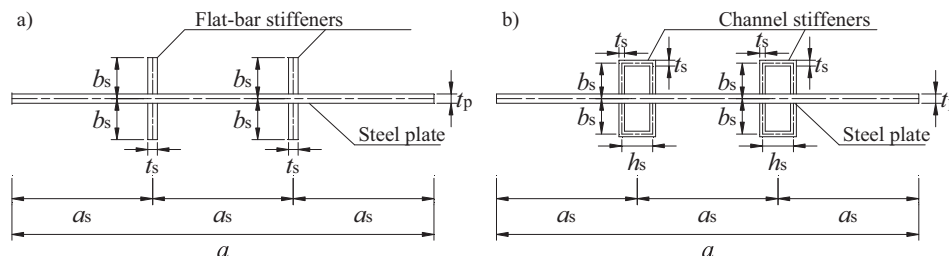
Notation of stiffened steel plate walls with: a) flat-bar stiffeners, b) channel stiffeners.
